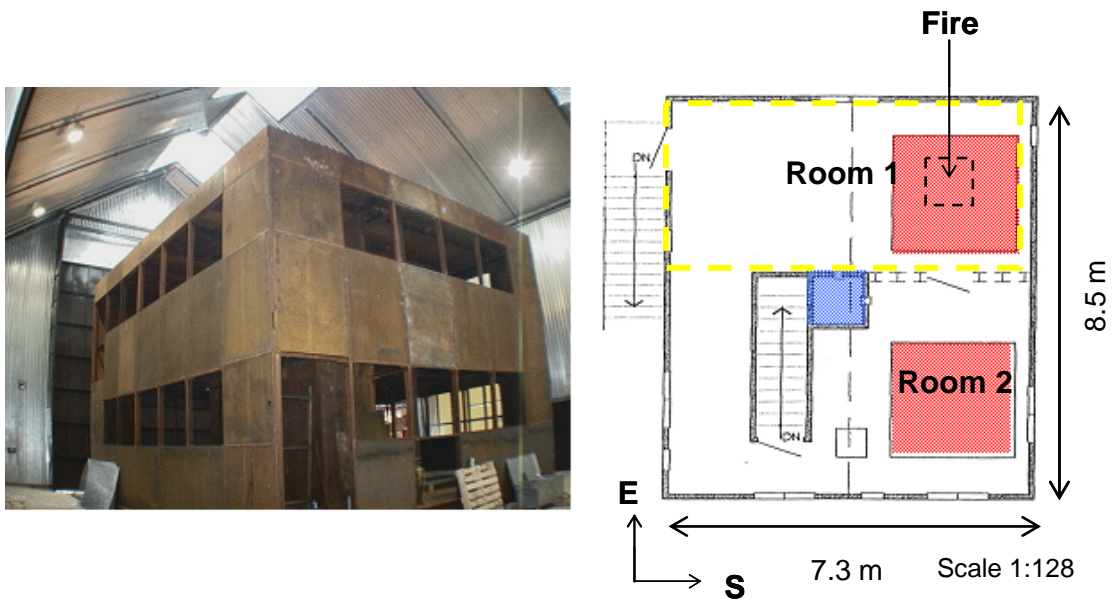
Burn House Situated inside the Test Enclosure (left) and Second Floor Schematic of the Floor Plan (right)
